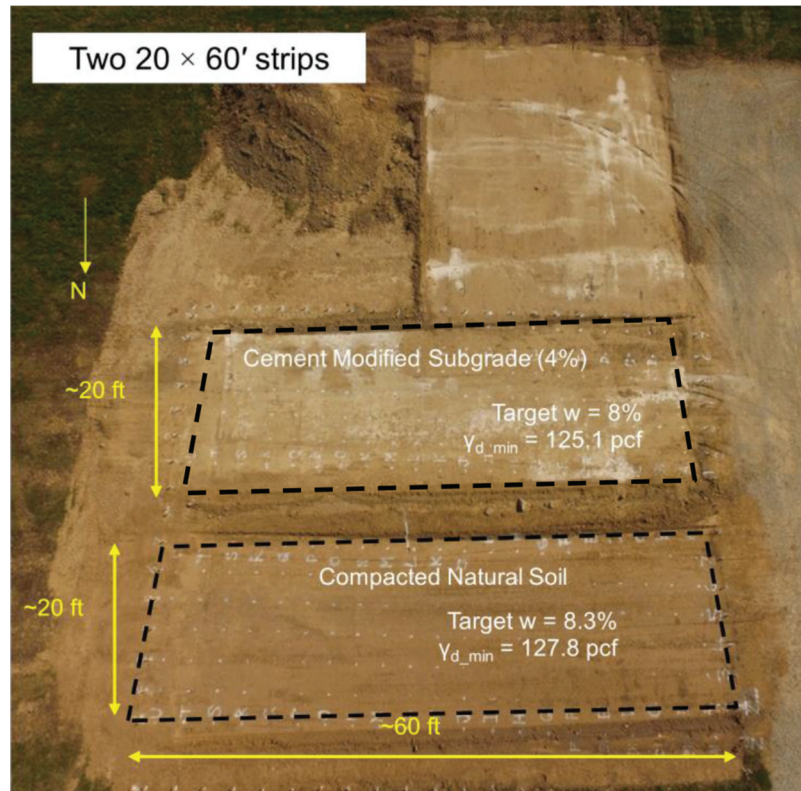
Layout of S-BRITE cement modified subgrade and control subgrade test sections.
